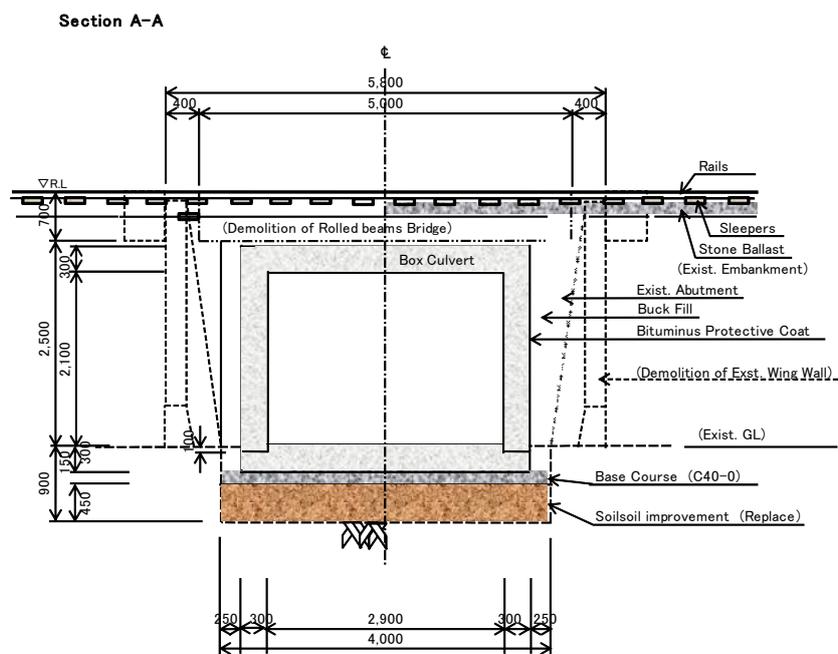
Box Culvert (Reconstruction Plan, 1/2)
